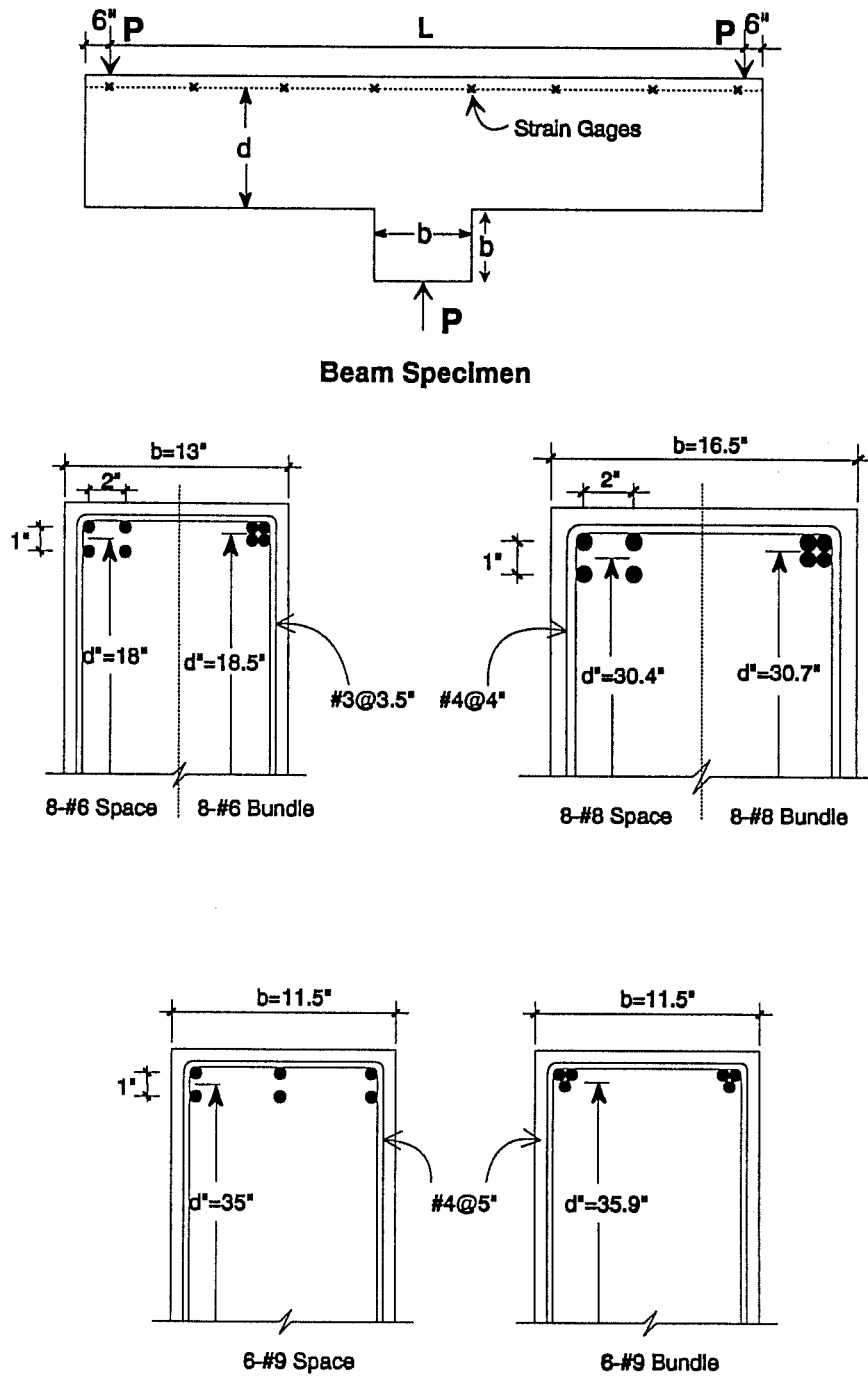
Beam specimen for comparable bundled bar test (Ref. 7)
